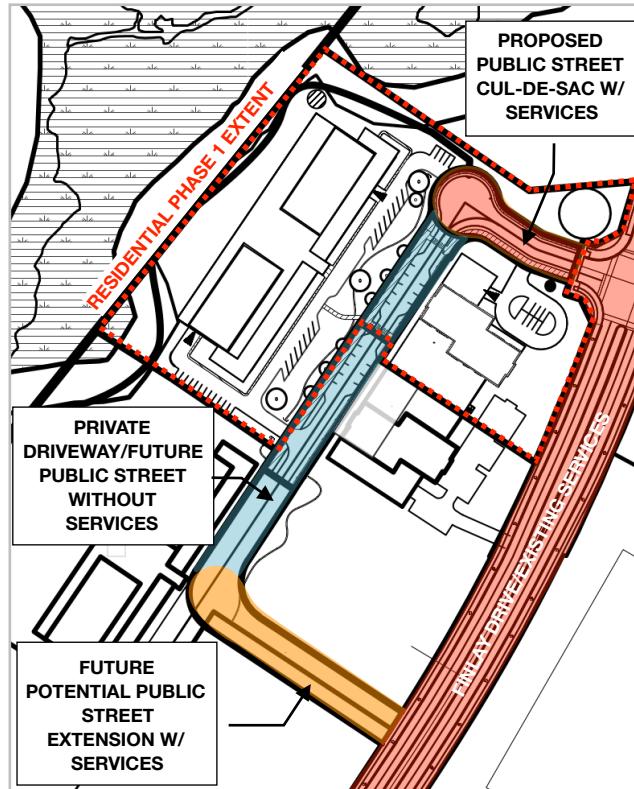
Proposed and future servicing strategy via Finlay Drive. The central Esplanade street, to be eventually deeded to HRM, is not needed for servicing proposed or future buildings.
